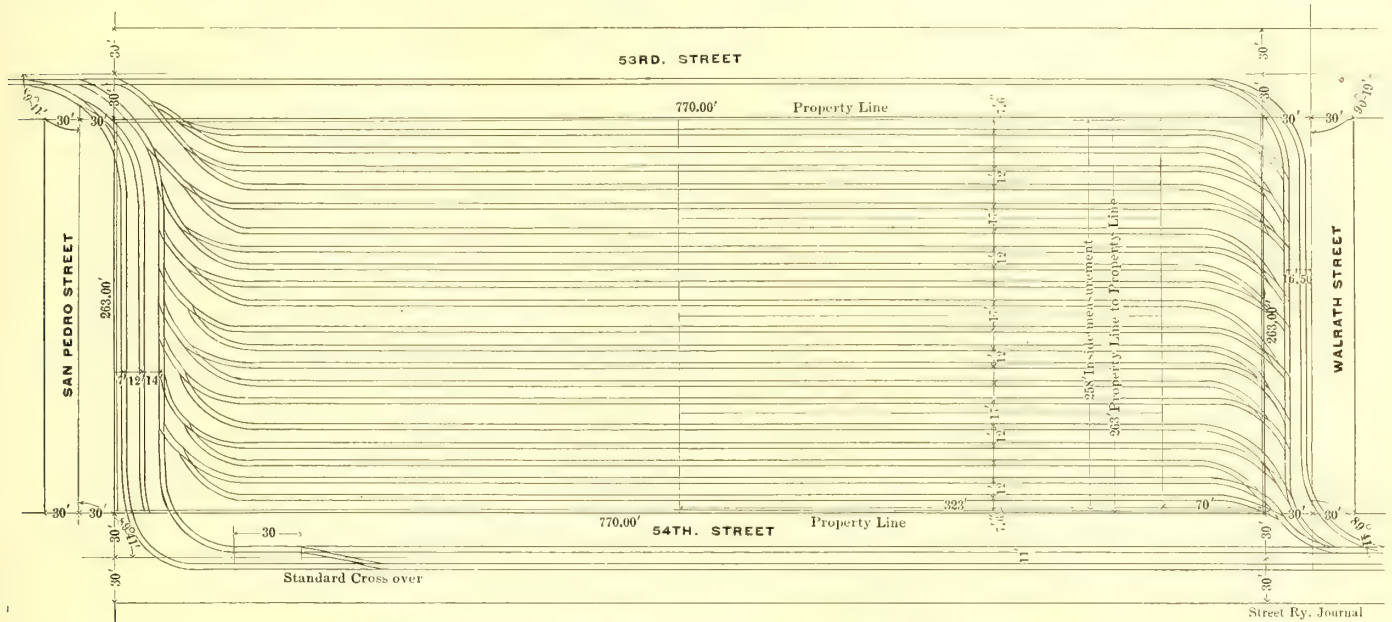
SOUTH PARK CAR HOUSE TRACK ARRANGEMENT
